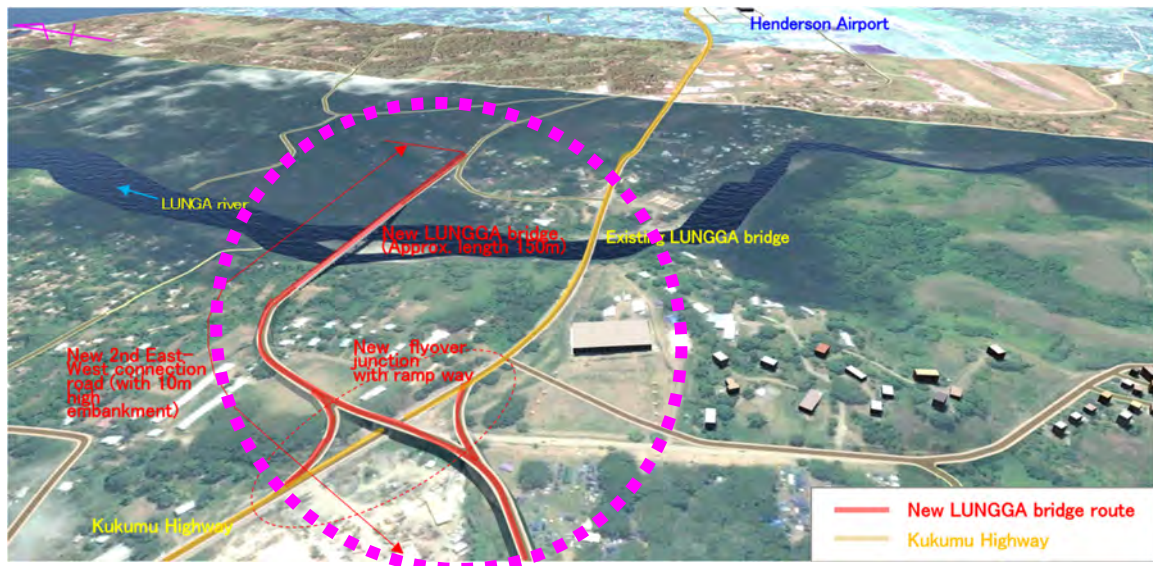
Image of Proposed New Lungga Bridge Alternative Road Construction (BR04+RD14)
